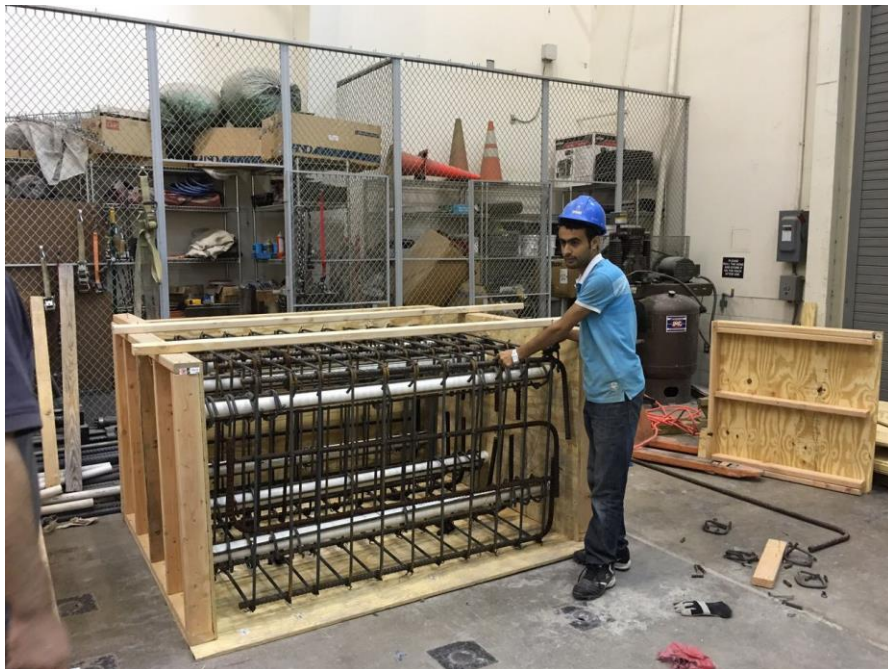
Preparing the supporting block (formwork, plastic pipes and steel cage)
